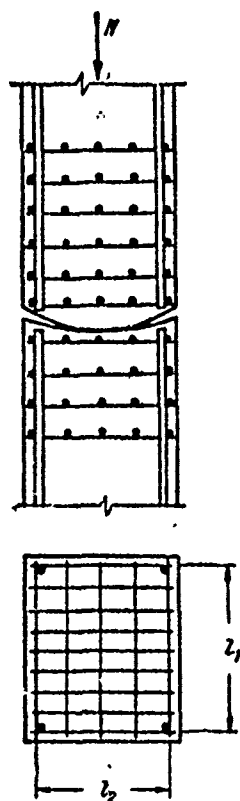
The structure of the joint of precast reinforced-concrete columns.
